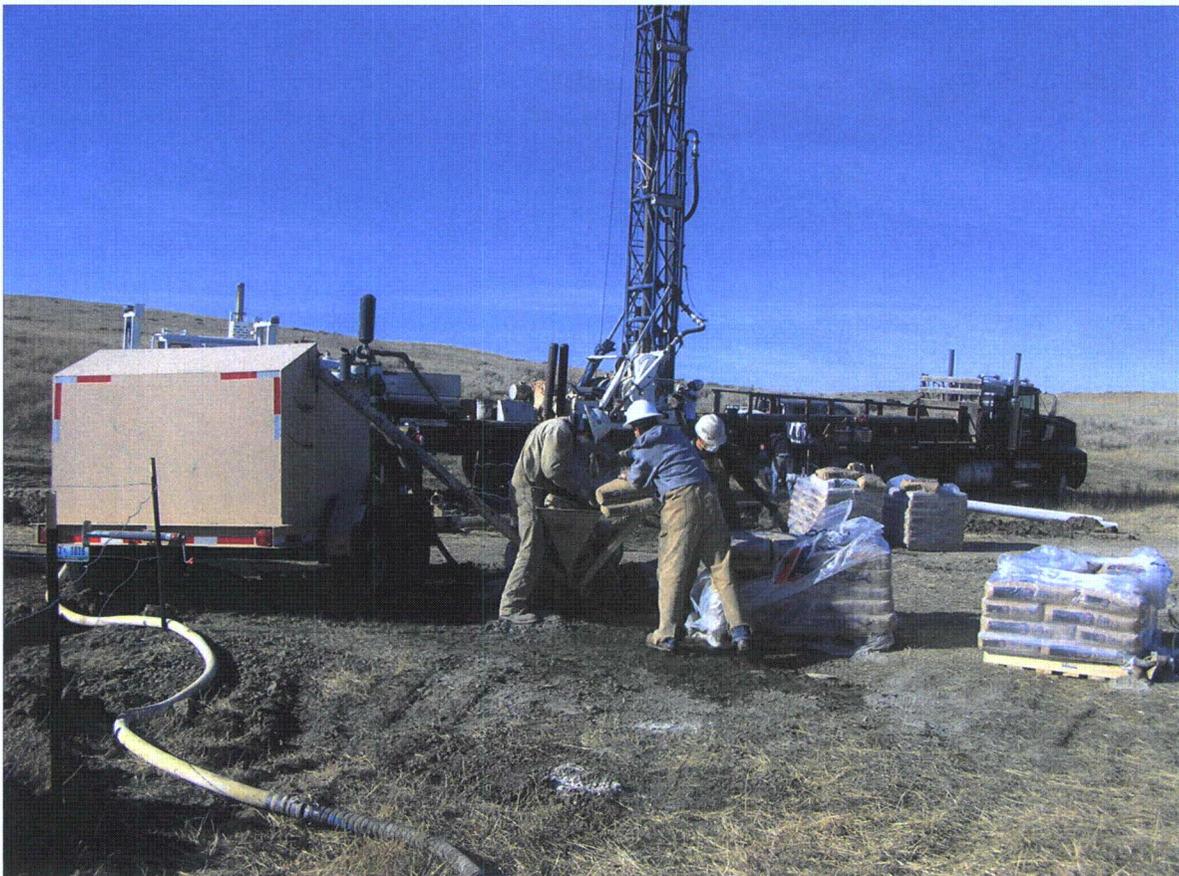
Mixing Cement-Up to 23 Barrel Batch
